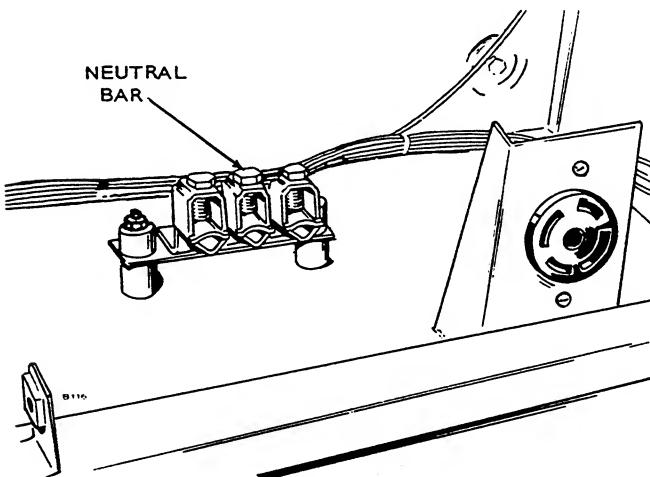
INSTALLATION OF NEUTRAL BAR
